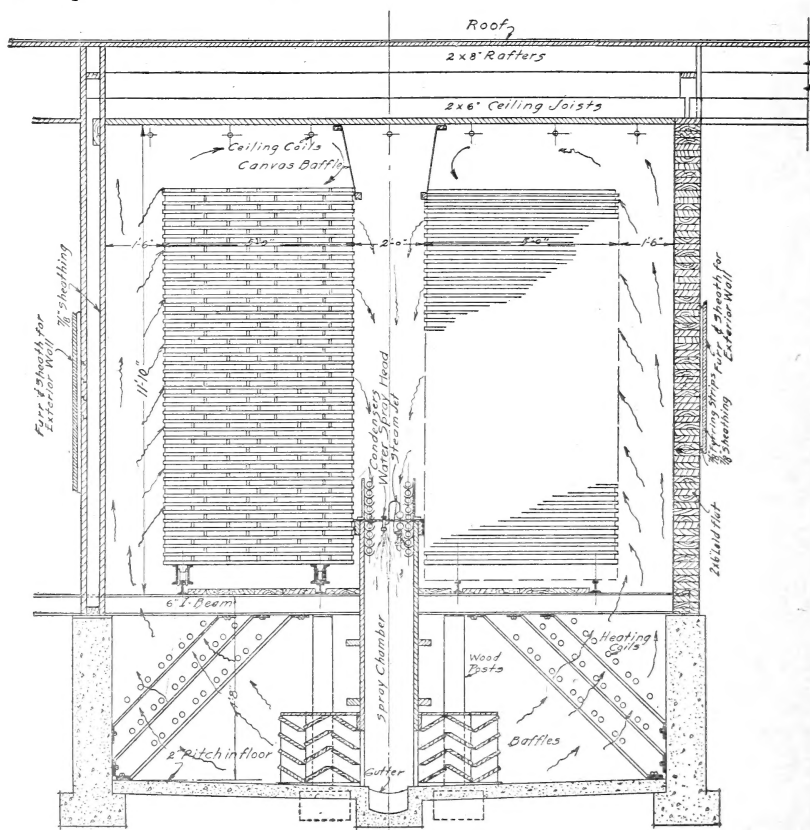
Typical cross section of kiln with center-spray chamber. Studs and sheathing, crib construction, wood roof, wood spray chamber, wood posts.
